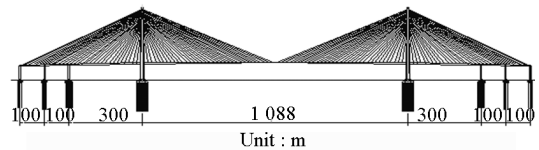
The span layout of the main bridge of Sutong Bridge (unit: m)
